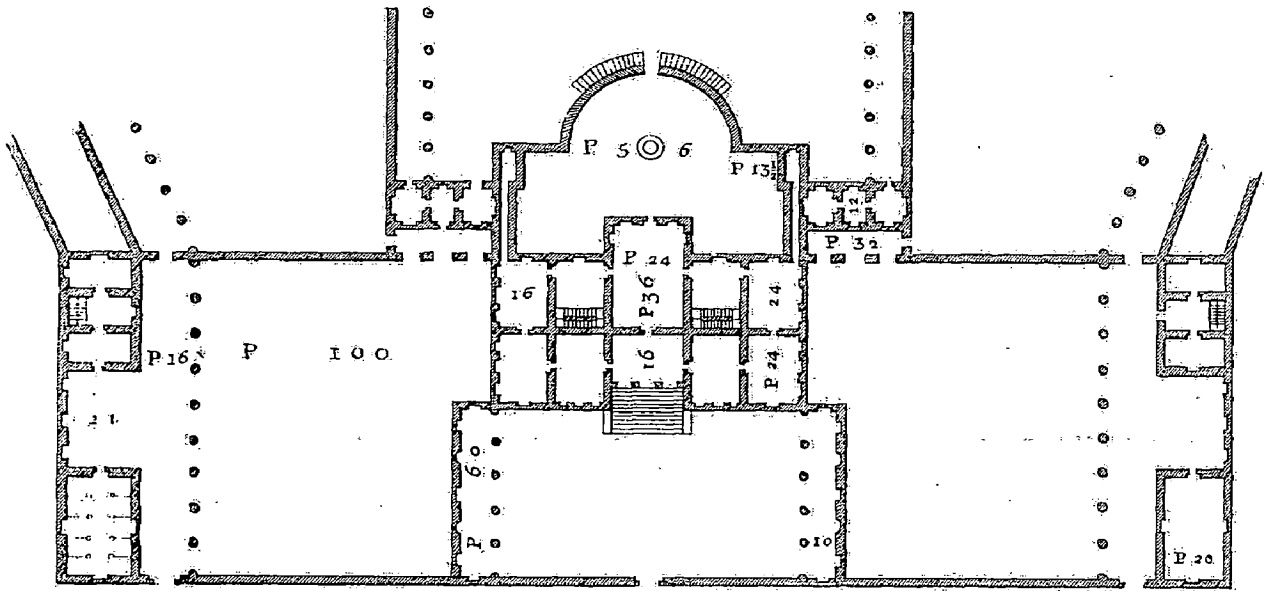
Villa Girolama De Godi at Lonedo in plan and elevation
